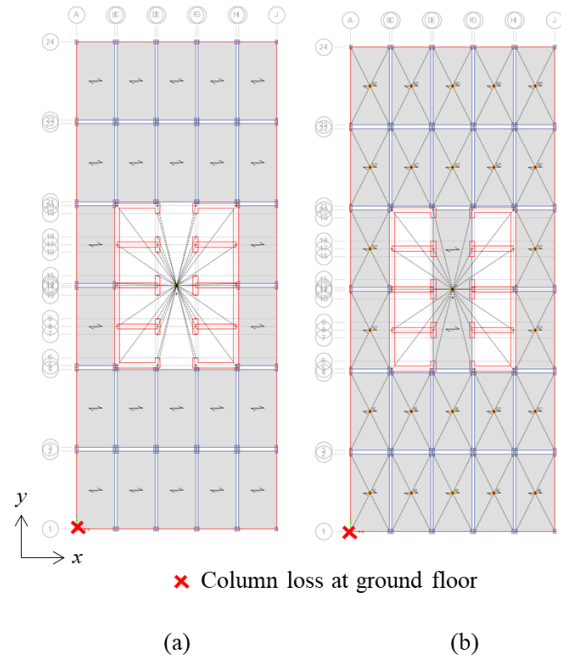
Plan view (a) ceiling level, and (b) floor level.
